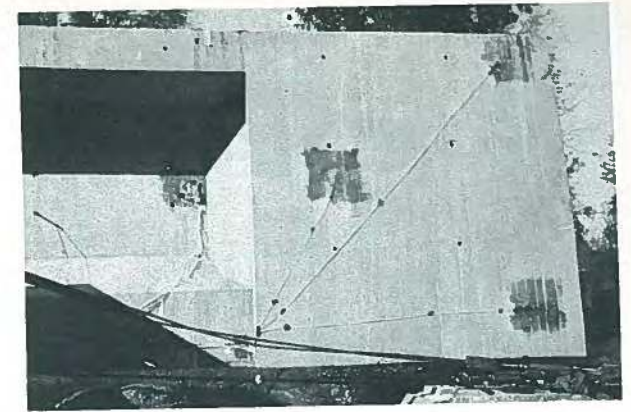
West end of Walnut Lane test girder, showing clinometer. Strain gage load cell is located over jack.
